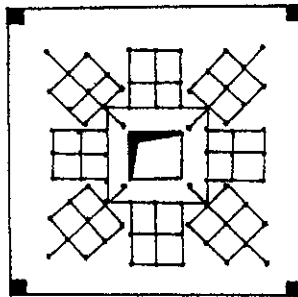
Dimensions and reinforcement arrangement for the tested slabs.
